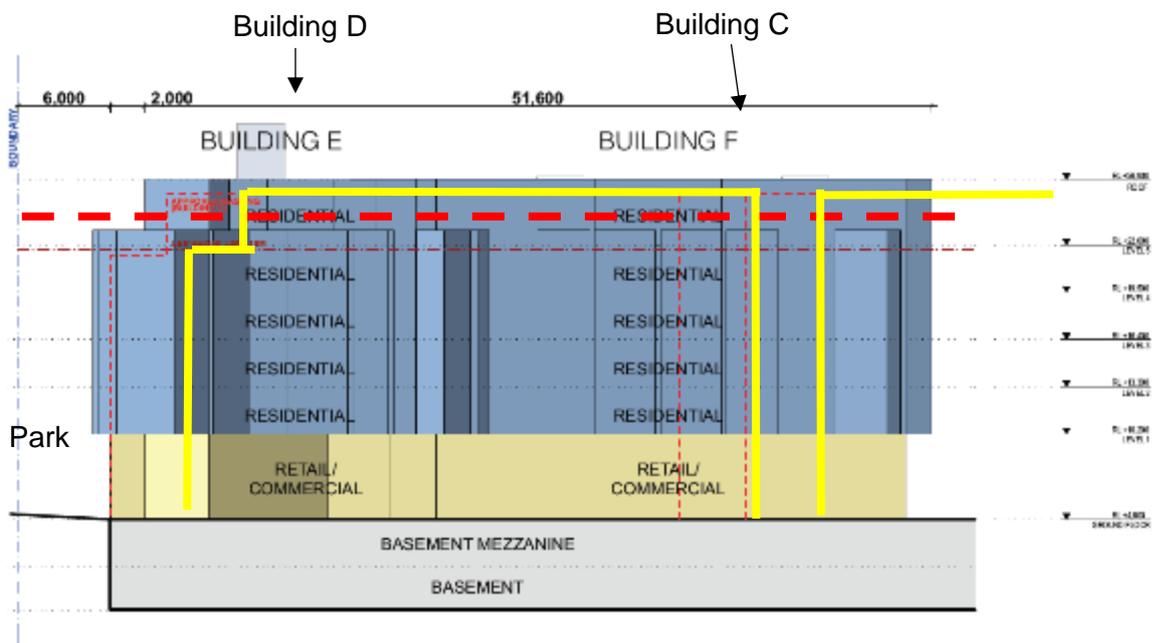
West elevation of building C (Euston Road) and D (corner of Euston Road and Sydney Park). The yellow line shows the approved concept envelope and the red dashed line shows the 18 metre height limit.
